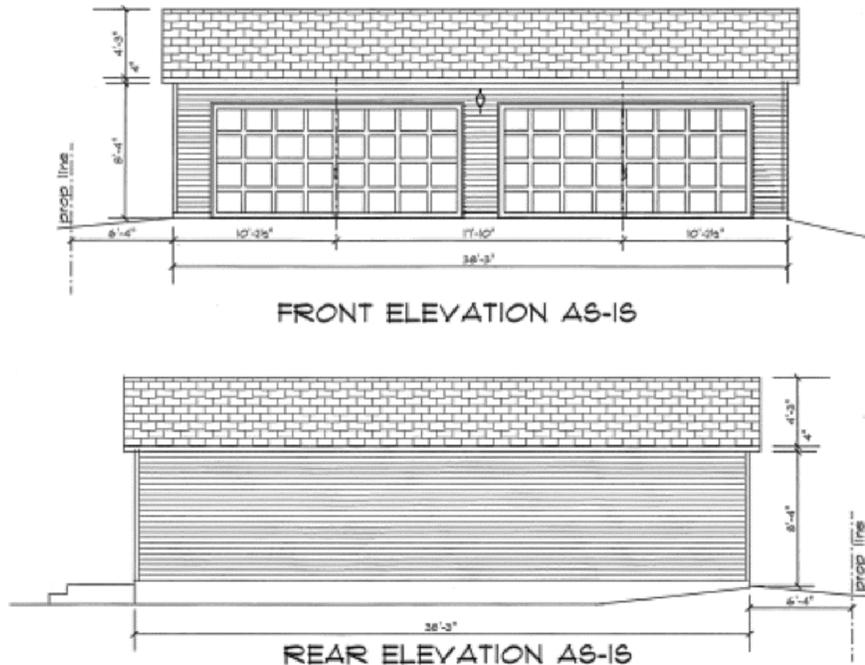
Front and rear (east and west) elevations of existing detached garage. Source: Applicant.
